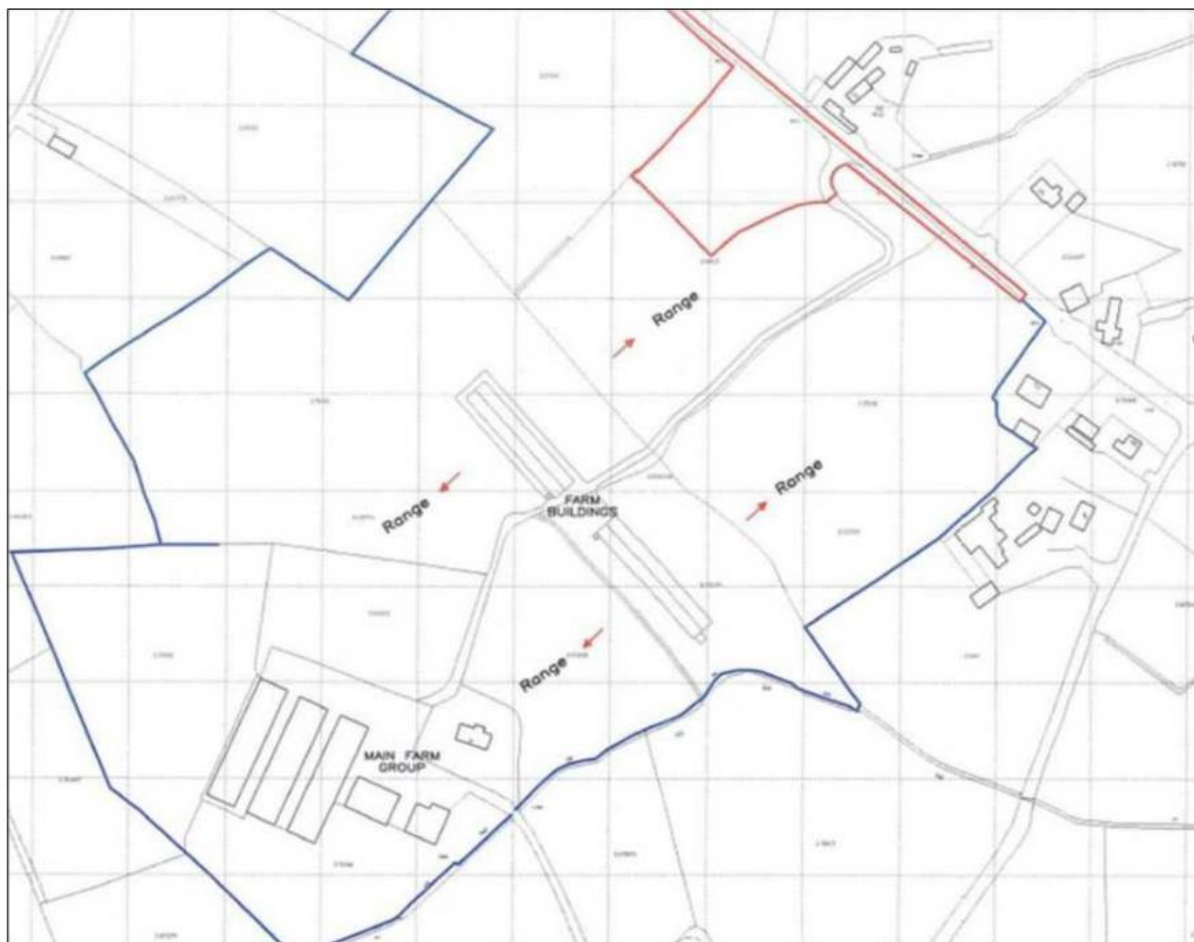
Site location plan showing site outlined red and applicant's farmlands including buildings outlined blue
